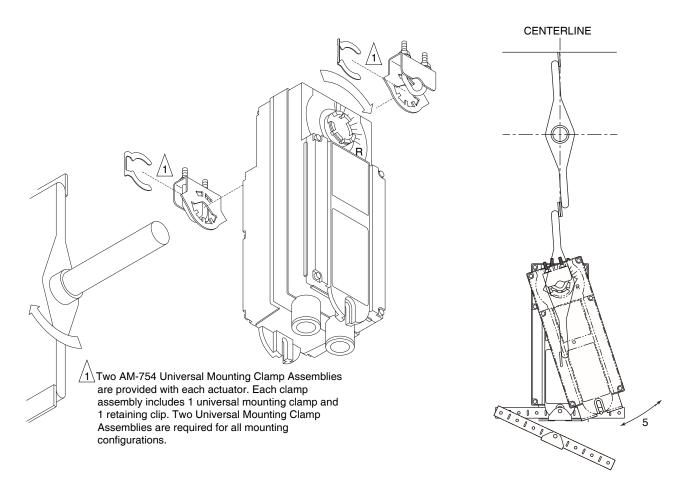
Long Damper Shaft Mounting with Clockwise Spring Return for Normally Closed Damper.
